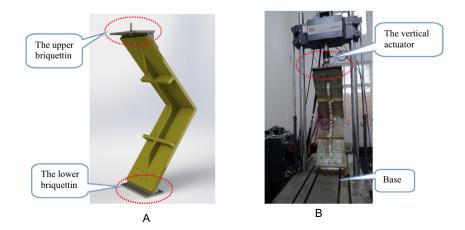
Specimen and equipment: (a) specimen fixture; (b) test platform.
